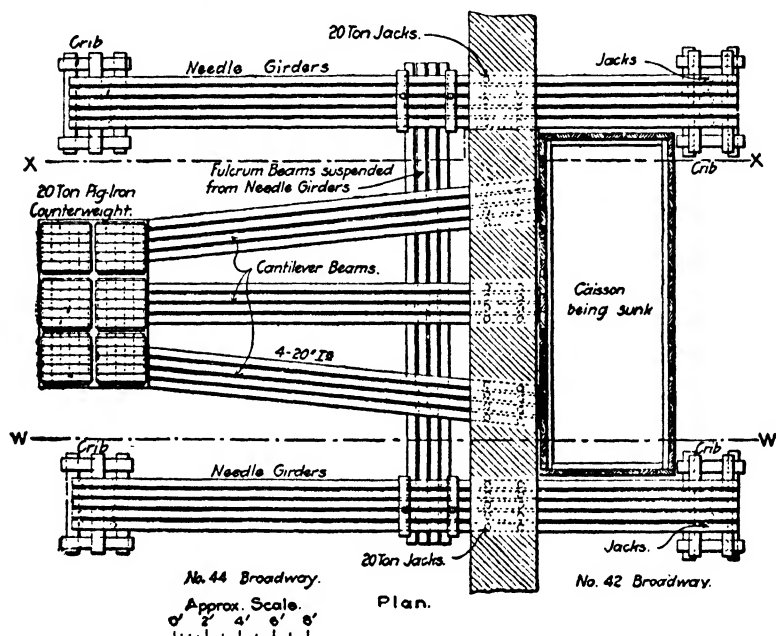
Counterweighted Needle-beams and Girders for Building at 44 Broadway, New York City.
